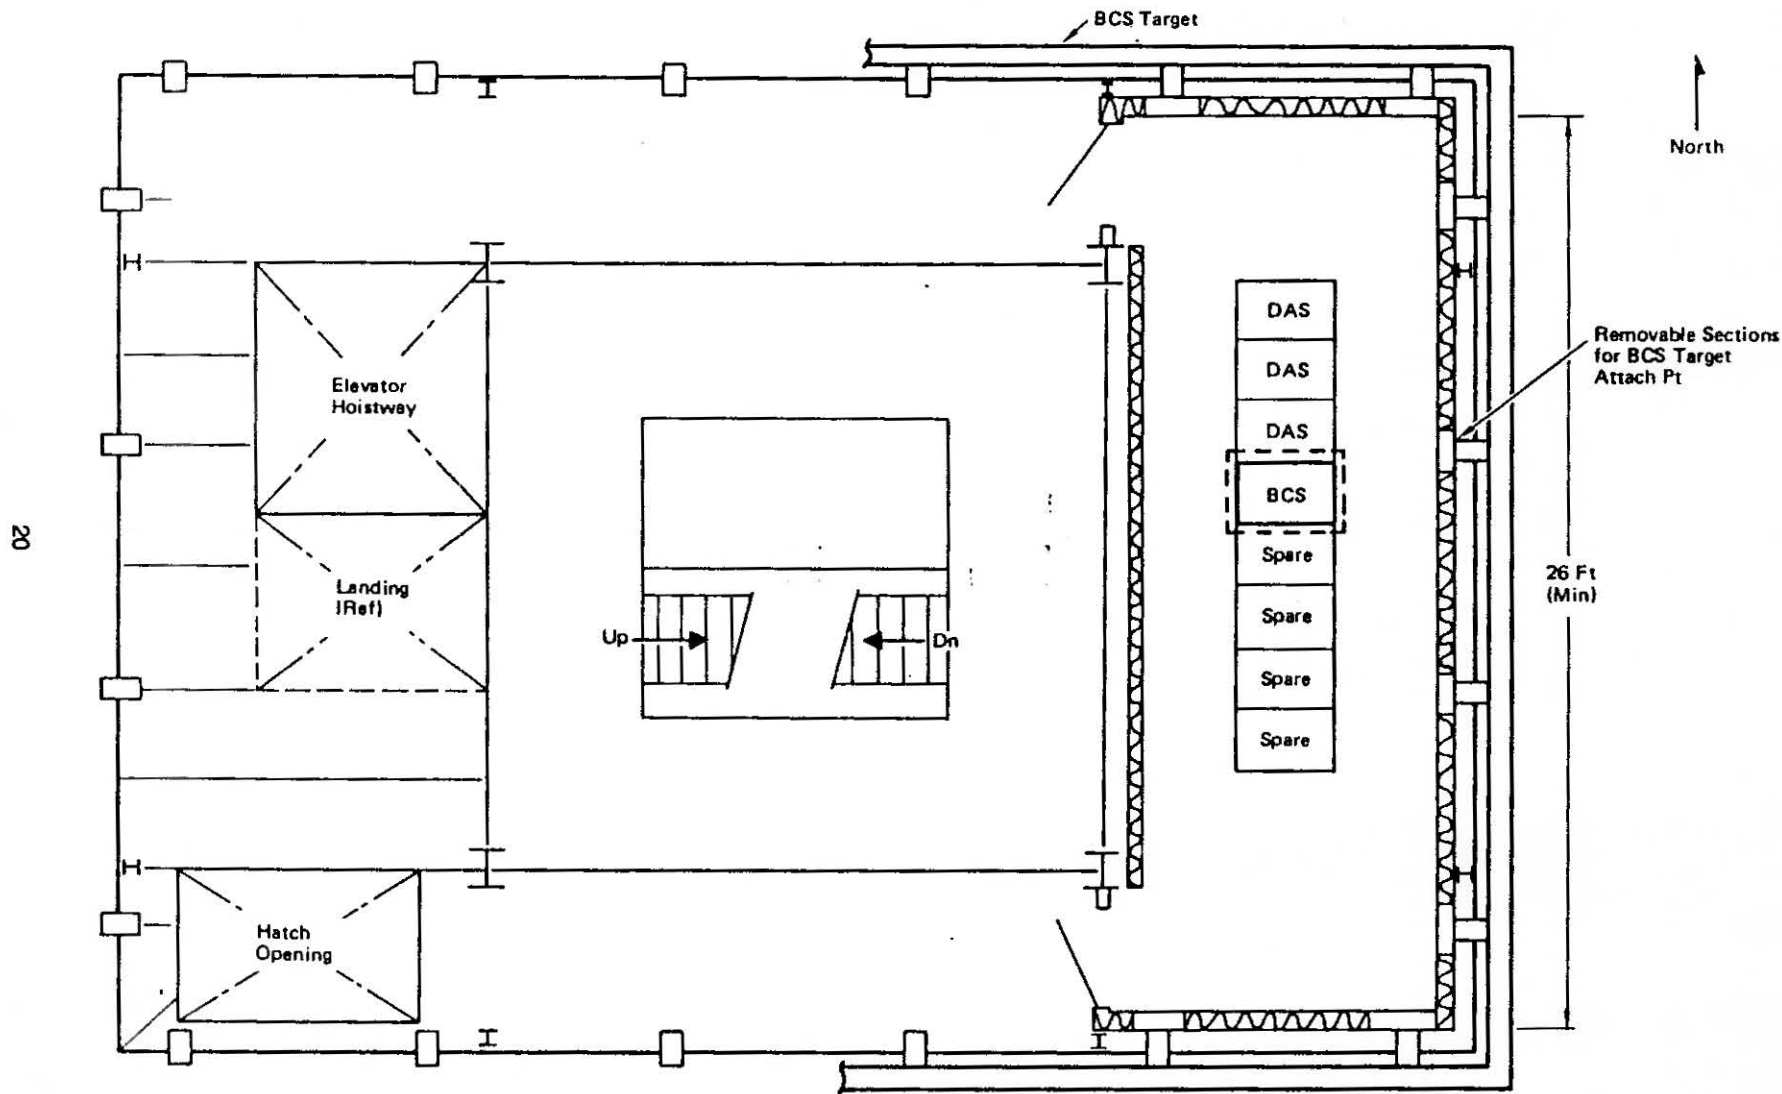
Equipment Orientation – Level 13 of Receiver Tower Landscape
